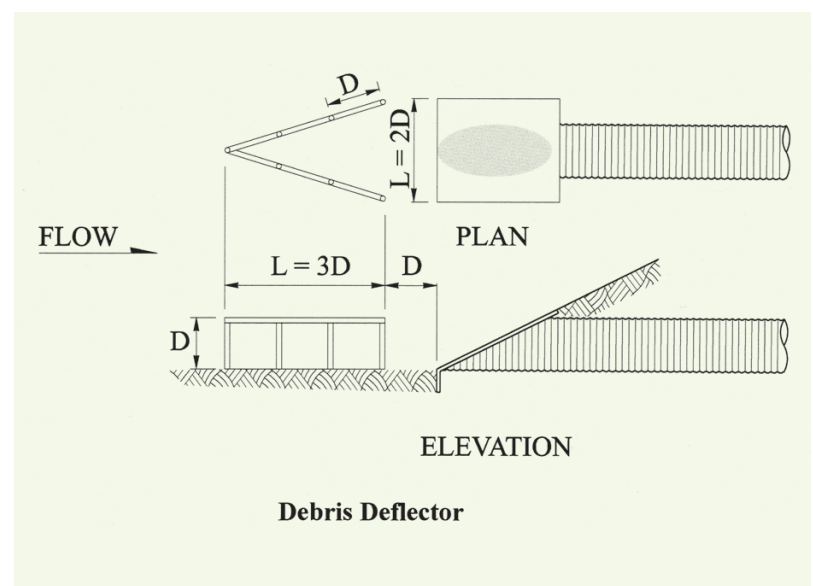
Debris deflector installed in front of a mitered culvert inlet with a sloping headwall. A deflector, by itself, cannot protect a culvert inlet from plugging with floating wood if the pipe is significantly undersized and flow ponds over the top of the deflector. The culvert should be properly sized for the design flow event (WDOT, 2010).
